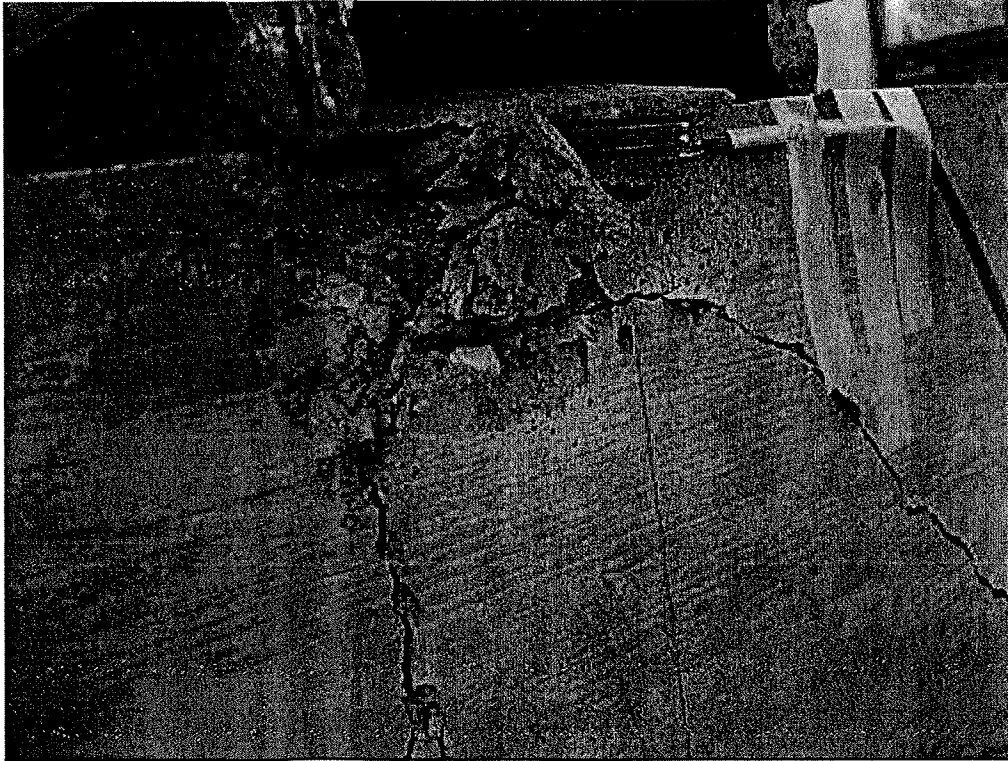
BRC-7 beam with flexural crack (first crack). The picture also shows the strain gauges fixed at the top of the concrete beam (compression side).
